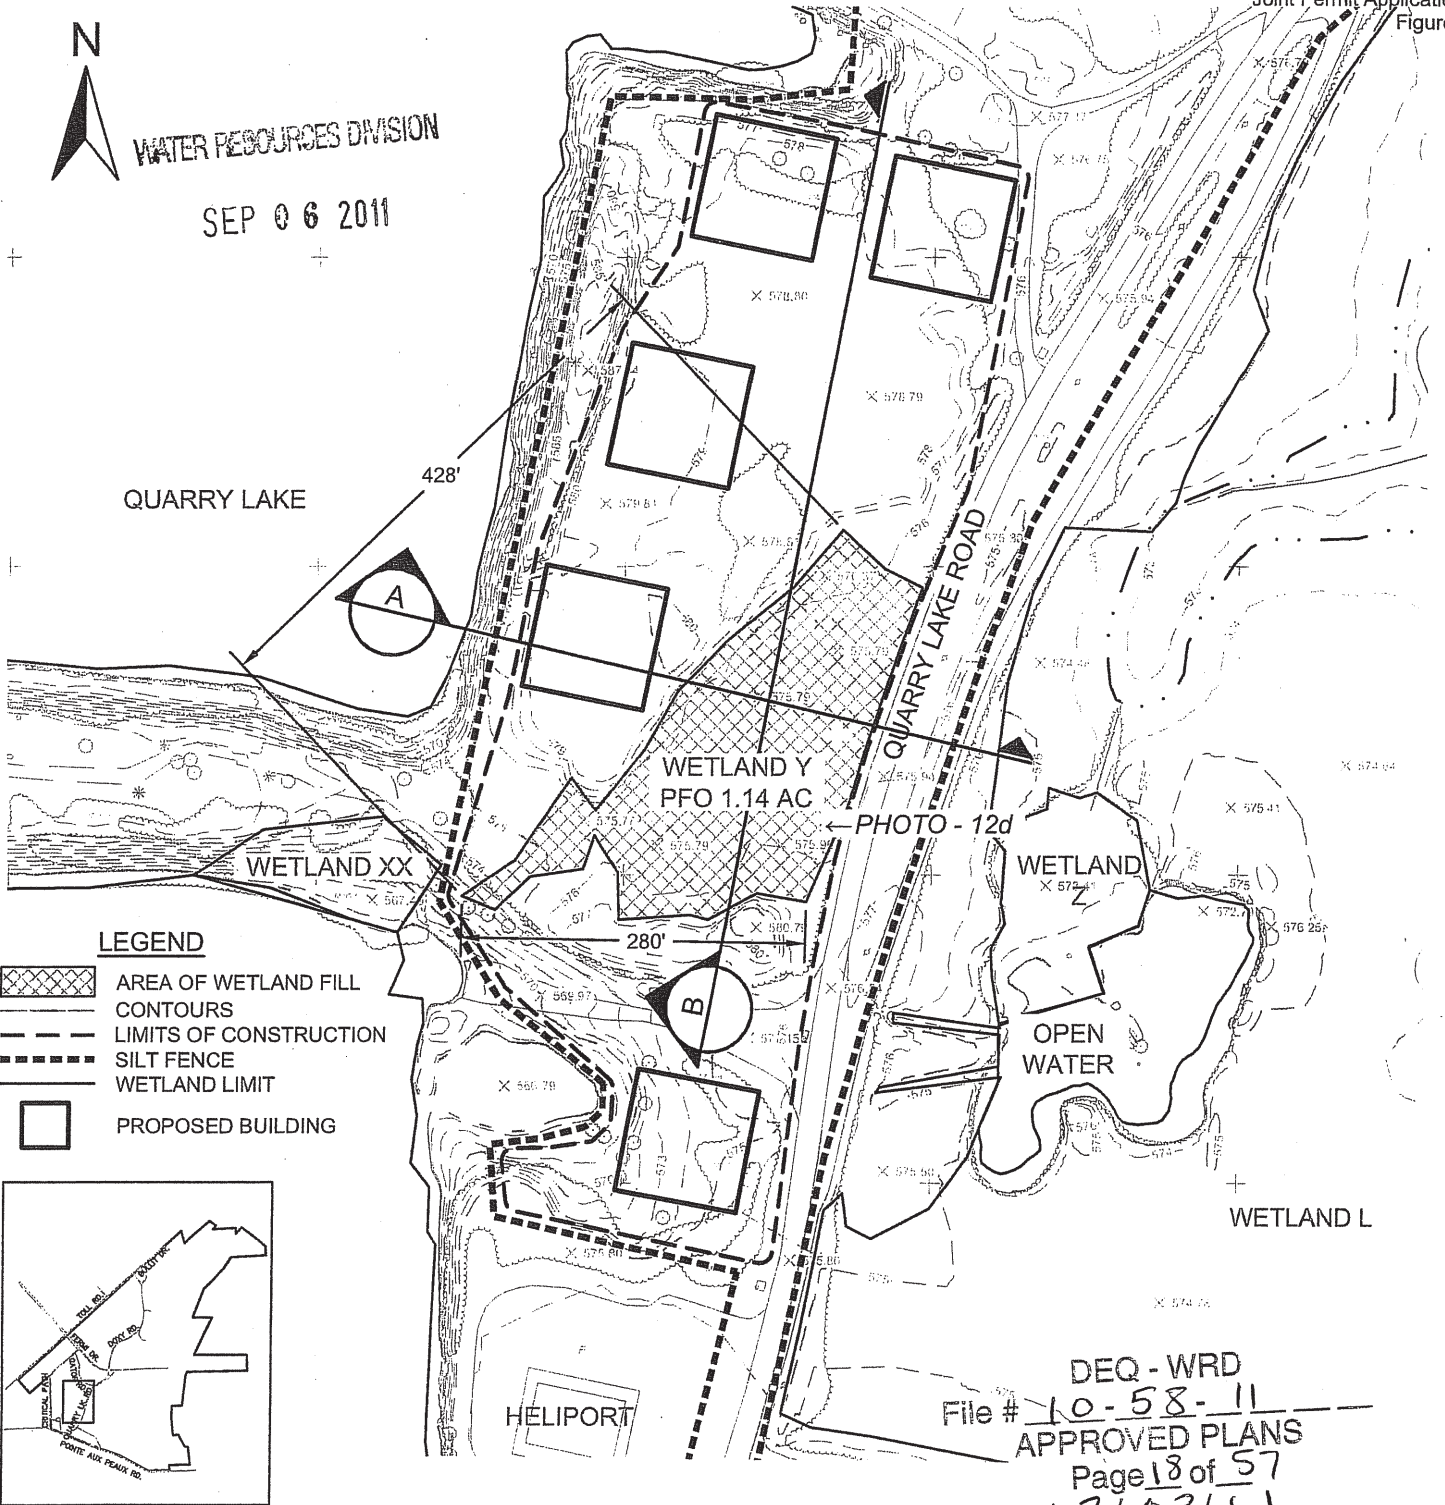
C CONSTRUCTION AREA 1 SECTION DETAILS
